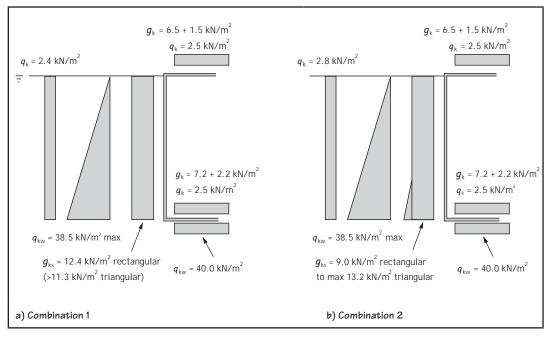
3 Characteristic actions on basement wall and adjacent slabs: water at ground level.
